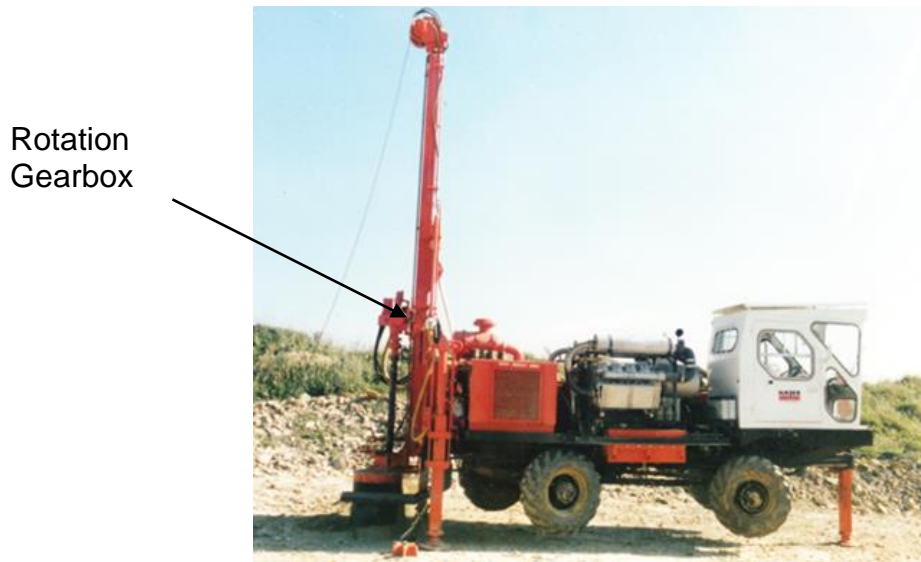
Self-Contained Rock Drill Showing Rotation Gearbox Location
